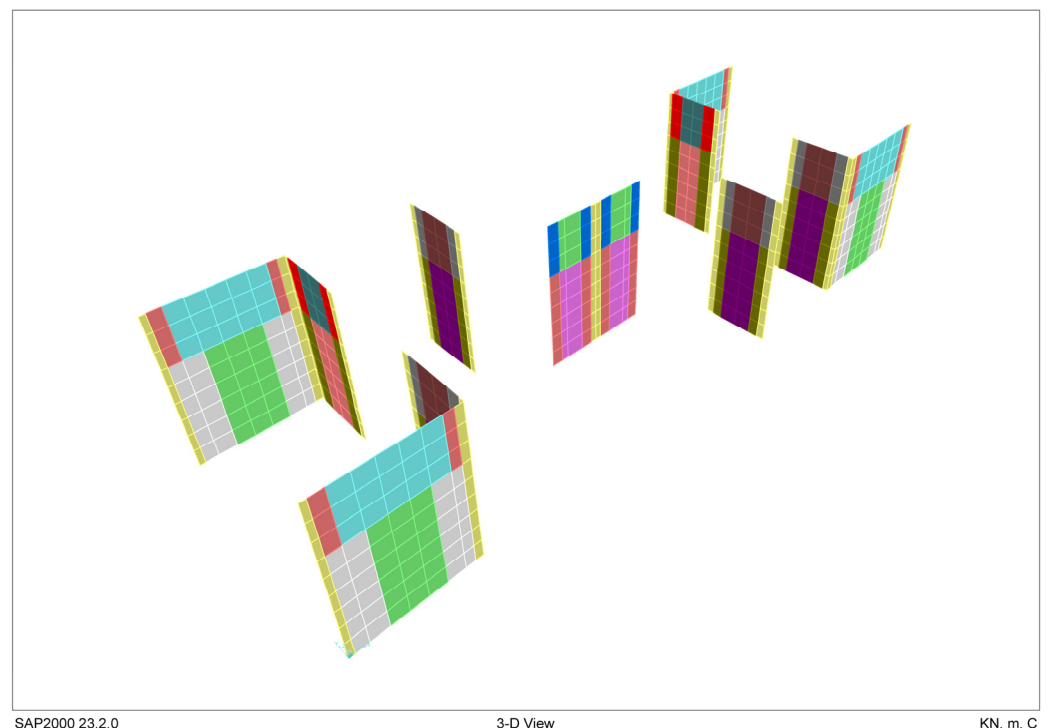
Reinforced concrete shear walls modeled as multi-layered shell elements for the nonlinear finite element analysis.
